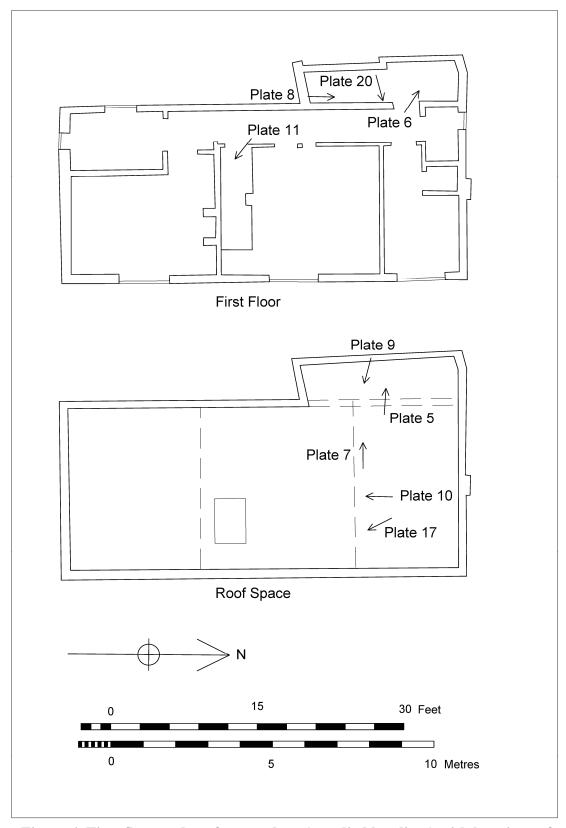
First floor and roof space plans (supplied by client) with locations of plates used to illustrate report.
